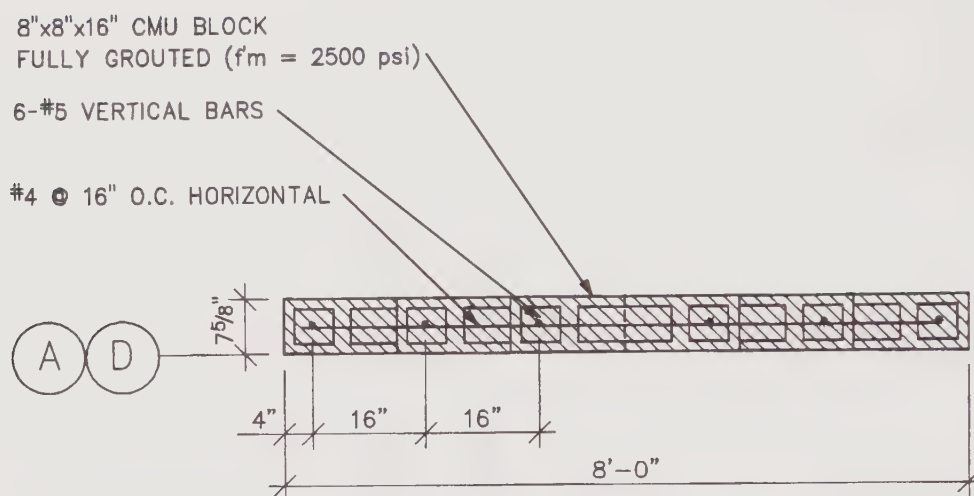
Reinforcement in 8-foot CMU shear walls on lines A and D
